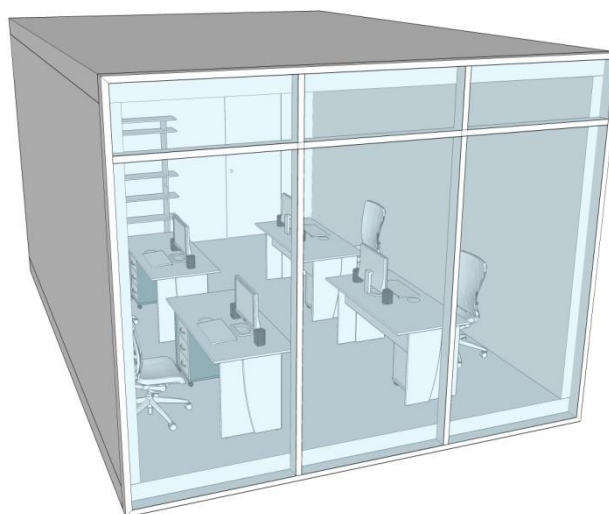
Typical furnished office room with double-glazed insulated curtain wall facing south. With dimensions of 4x6 meters and 3 meters high. Source: author.
